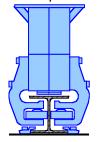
Traversing on concrete track, with 'L' shaped guide rail
